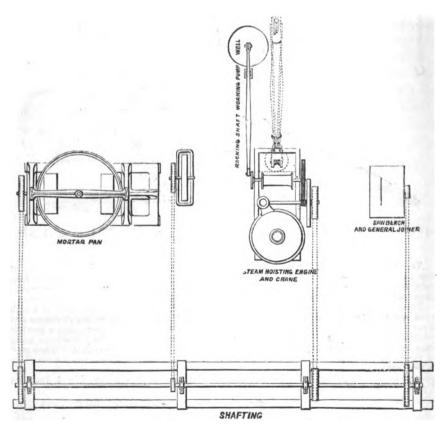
Sketch Plan, showing the same Engine set out for working the machinery usually required in the construction of large buildings.
